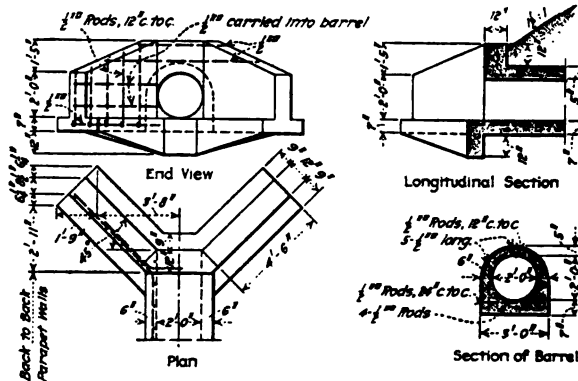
Standard design for 24-in. circular culvert, Iowa Highway Commission.
